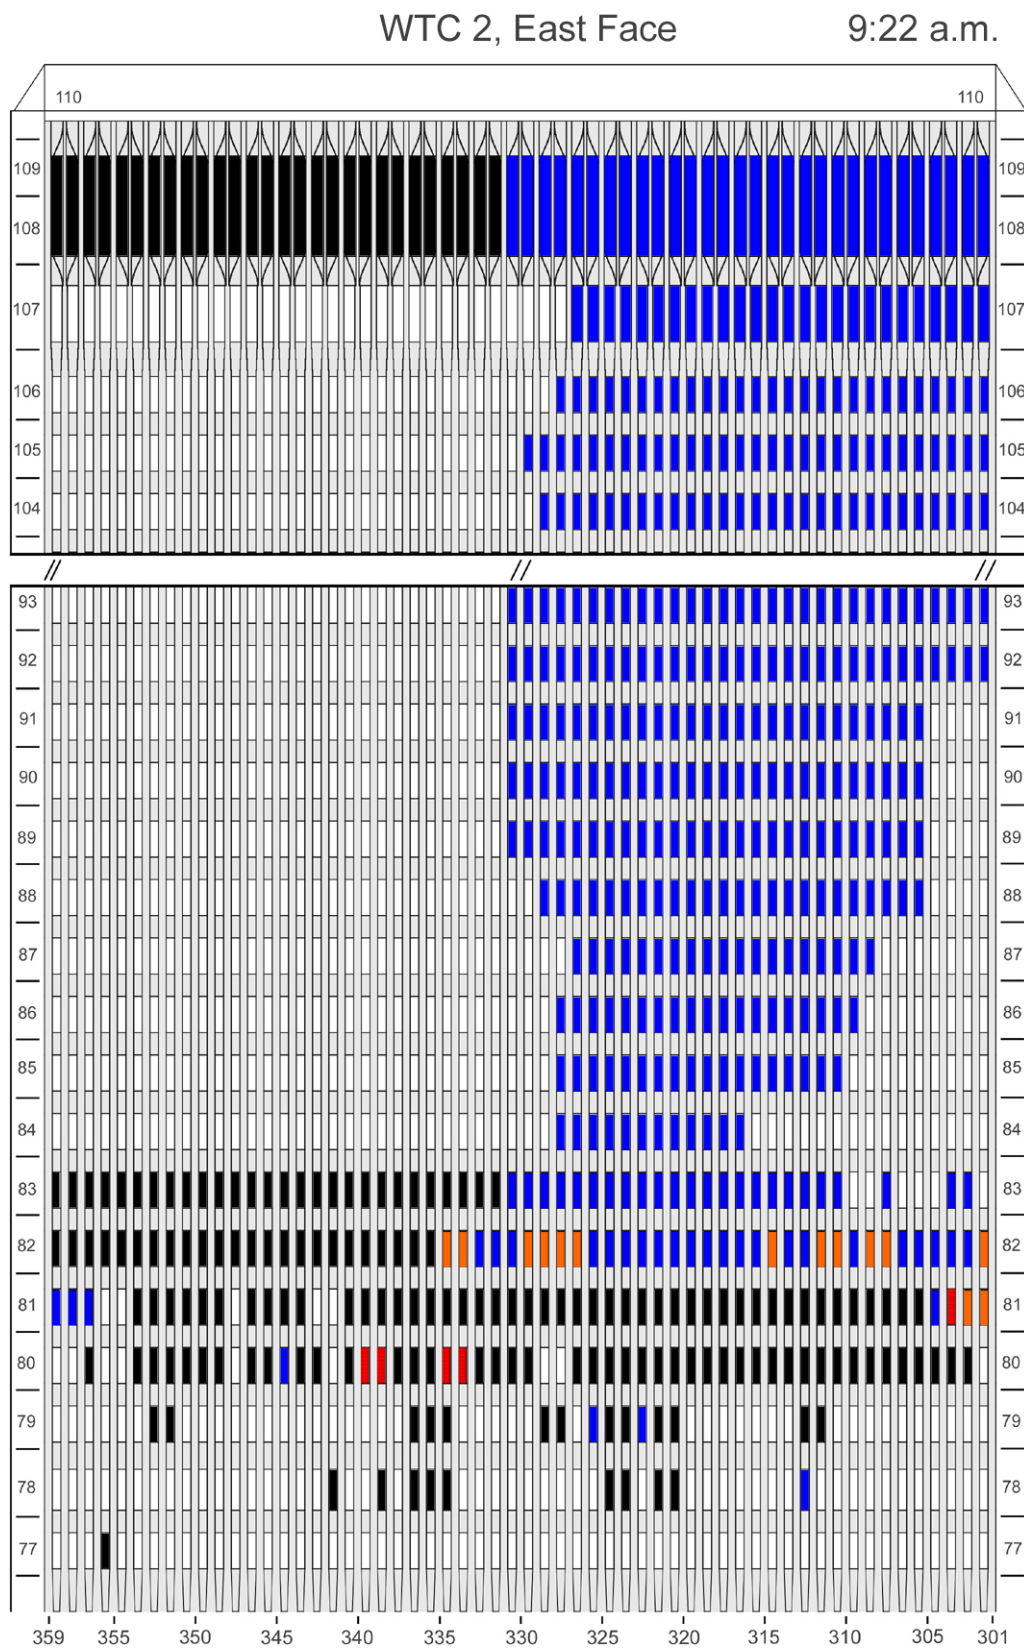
Diagram of the east face of WTC 2 for floors 77 to 93 and floors 104 to 110 at 9:22 a.m. showing the condition of windows and locations of fires.
